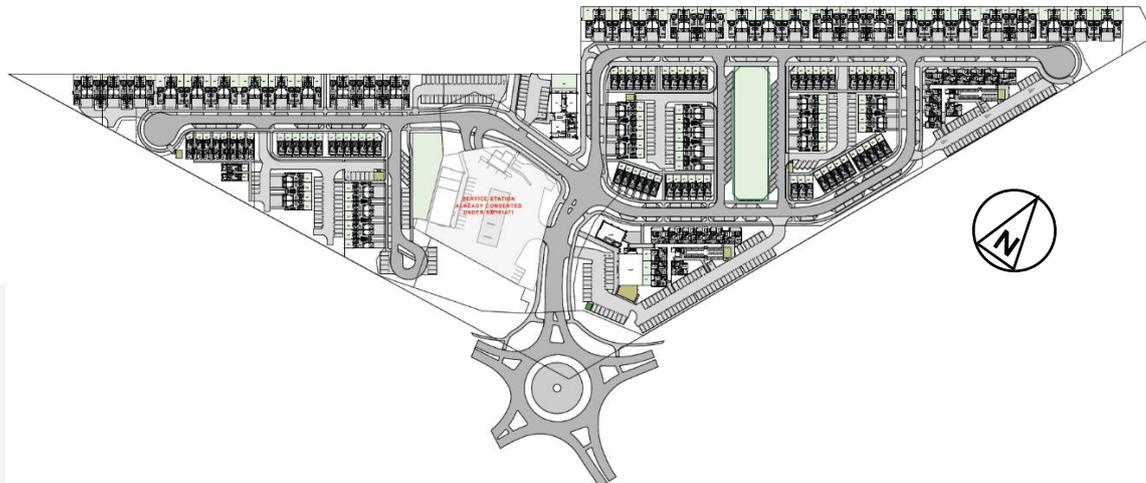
Proposed Site Layout (Extract from Figure & Ground Drawing)
